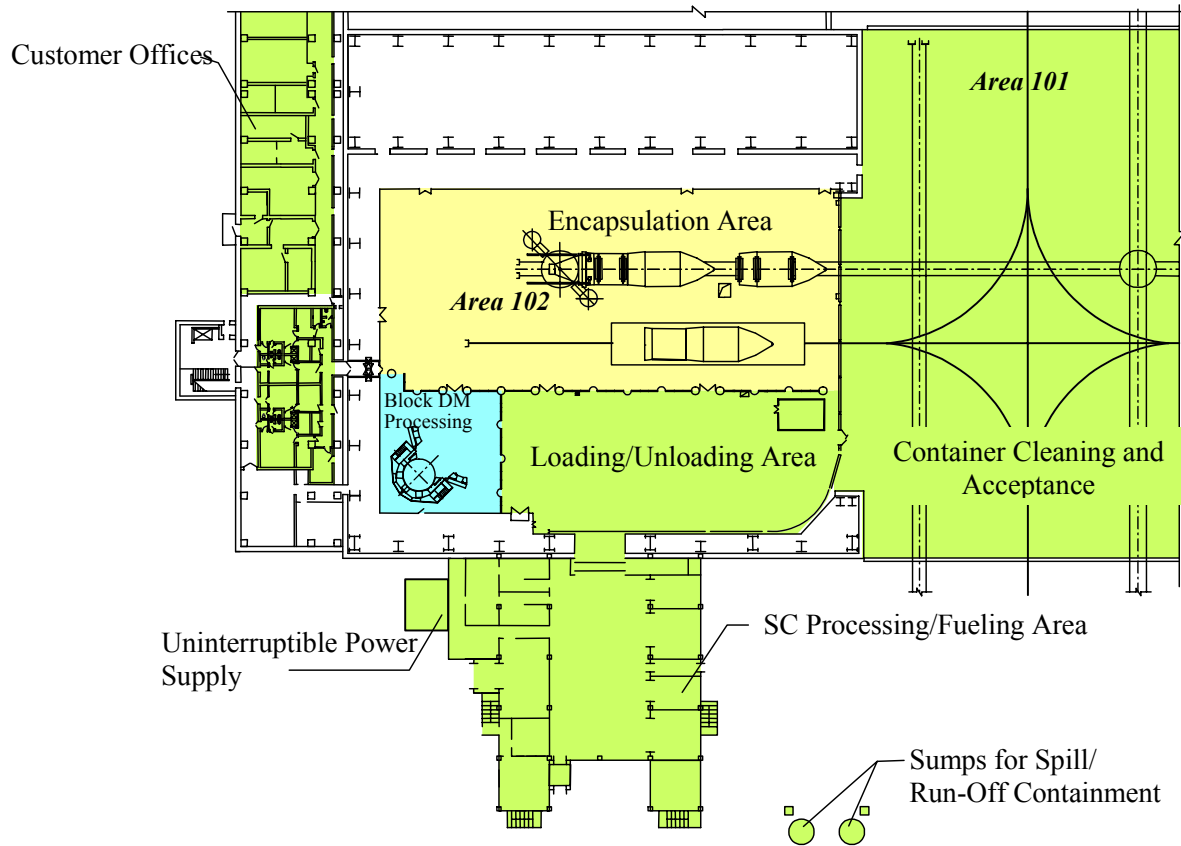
Lay-out of SC PPF at Site 254 with proposed adjacent building
